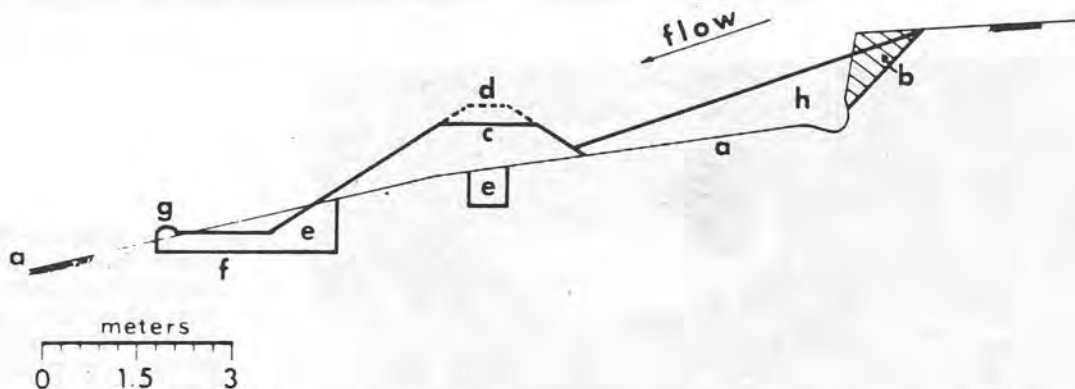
Construction plan for a gully headcut control with a loose-rock check dam. The section of the structure is parallel to the centerline of the gully. a = original gully bottom; b = excavated area of headcut wall; c = spillway; d = crest of freeboard; e = excavation for key; f = excavation for apron; g = end sill; h = rock fill.
